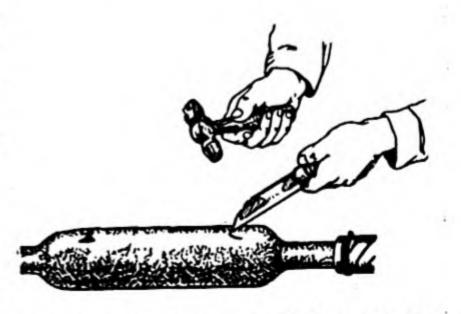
Cutting two V-shaped holes in the lead sleeve.
